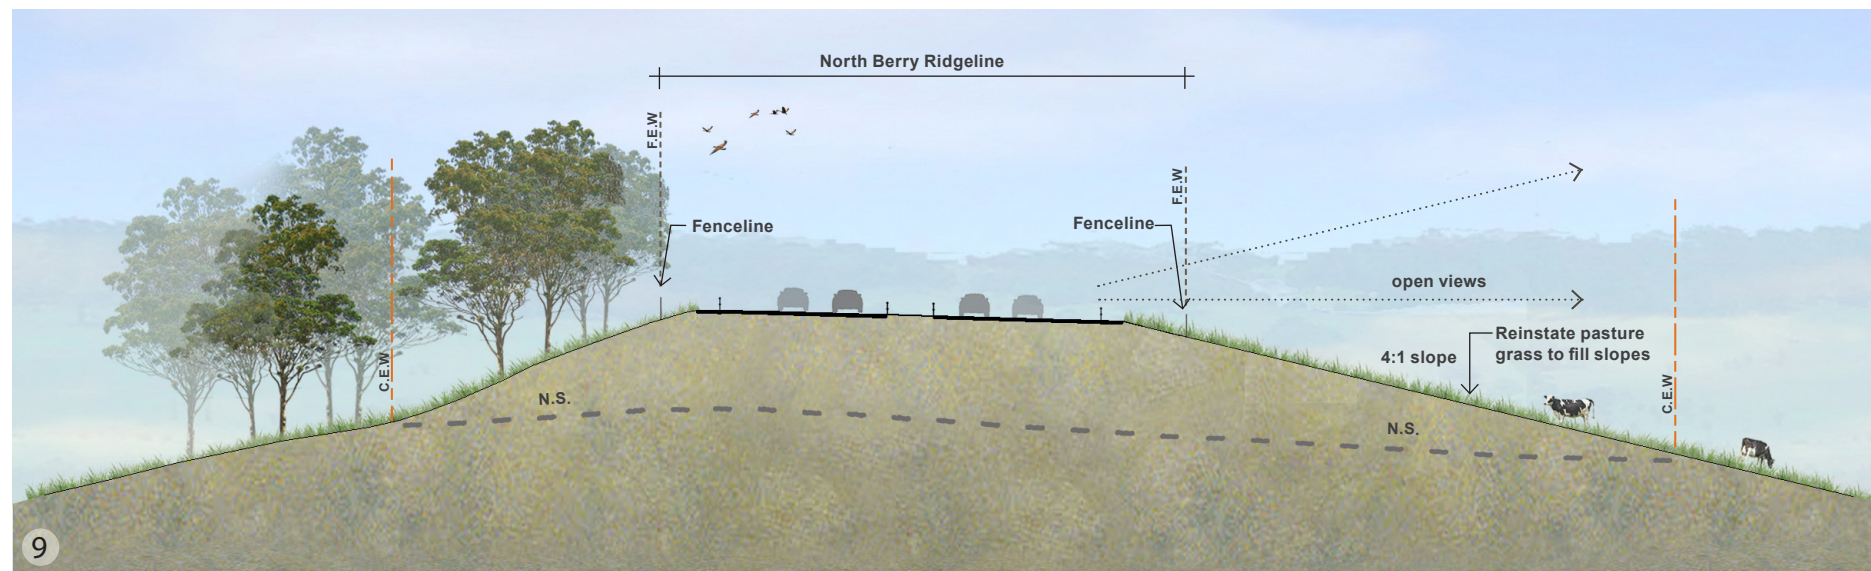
Elevation / section 9 - North Berry - chainage 15100
